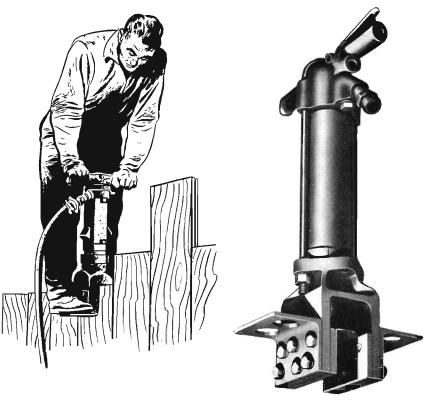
Pneumatic paving breaker with sheet-piling driver head.
